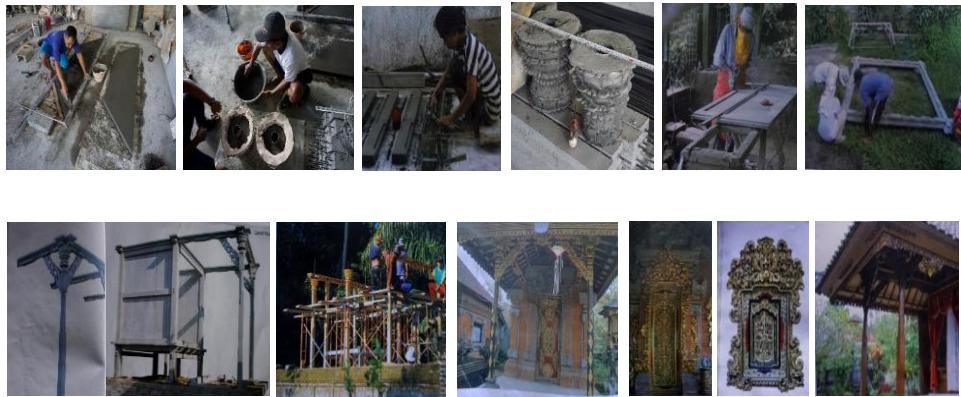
Use of Precast Concrete Ornaments in TBA Structures
